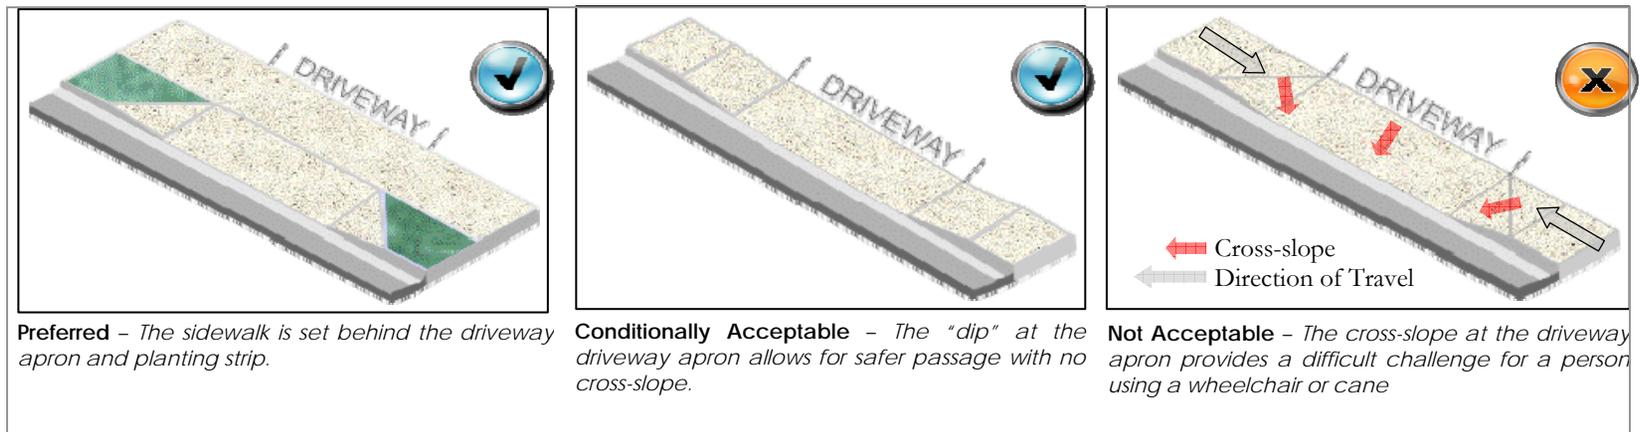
Examples of acceptable and unacceptable design solutions for minimizing cross-sloping at a driveway-sidewalk interface.
